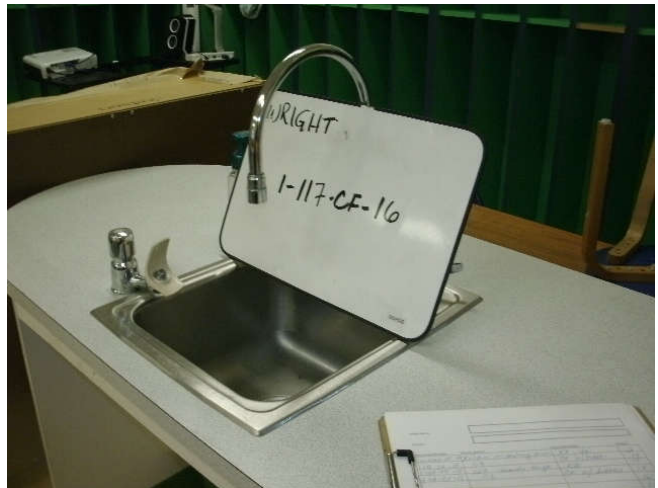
Classroom faucet w/bubbler, located on the 1<sup>st</sup> floor, in room 117.
